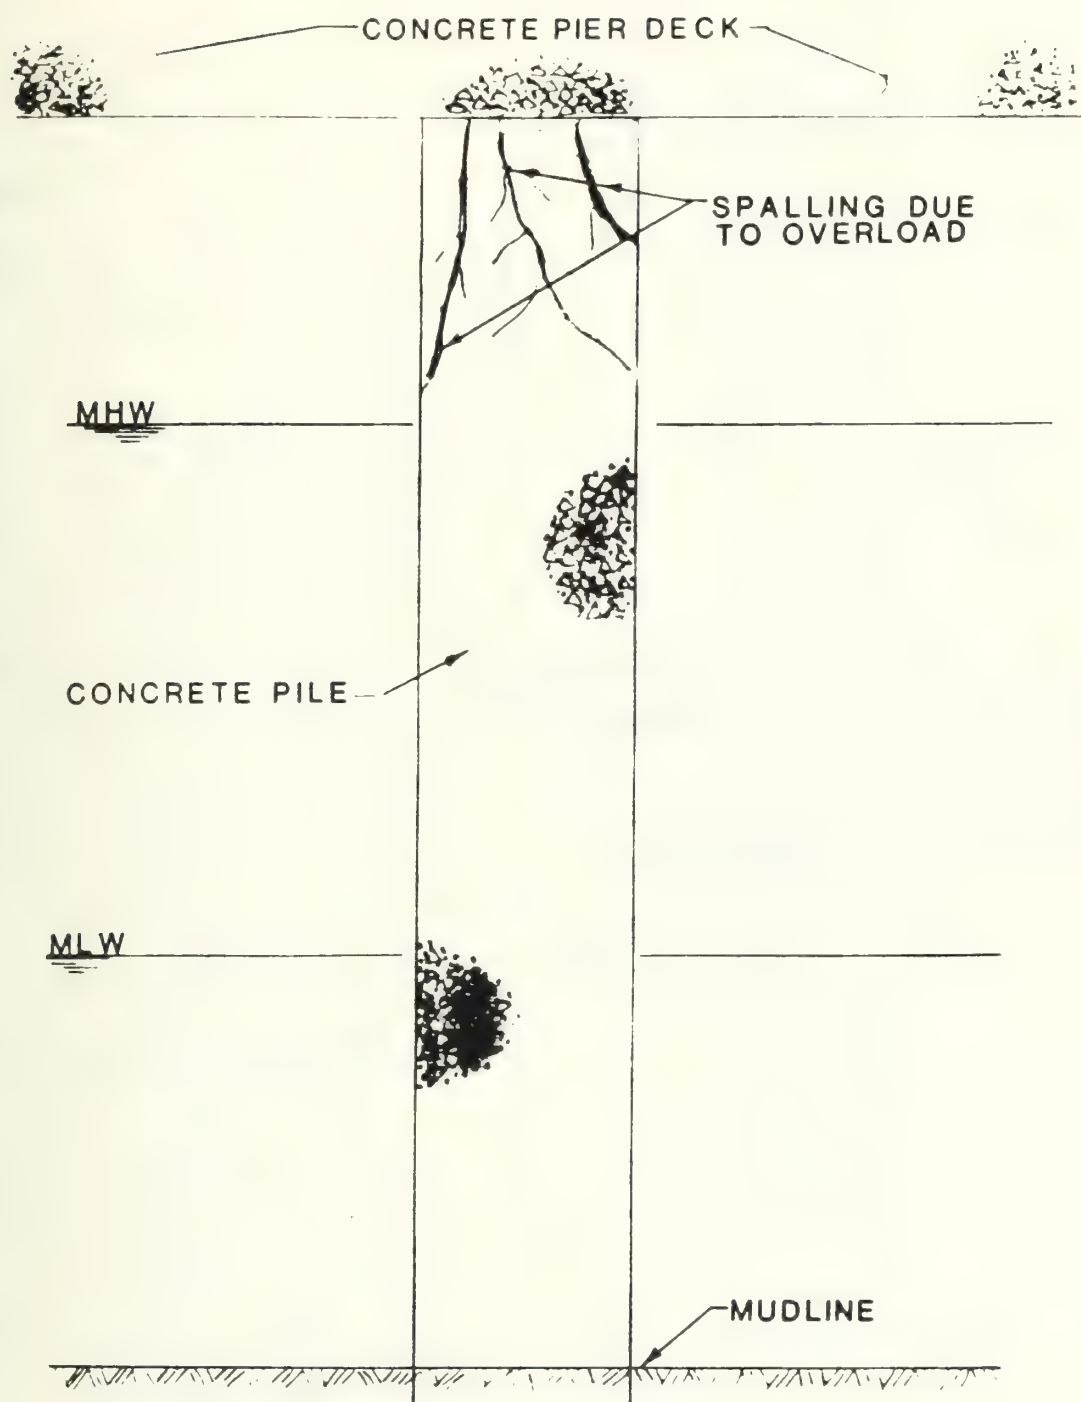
Deterioration of a reinforced concrete pile subjected to overloading
